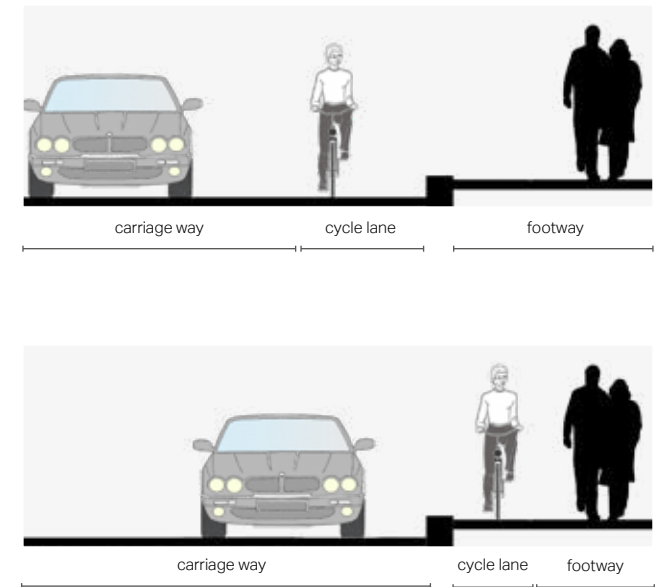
Cross-sections illustrating a shared cycleway and footway (source: Local Transport Note 1/20, July 2020).
